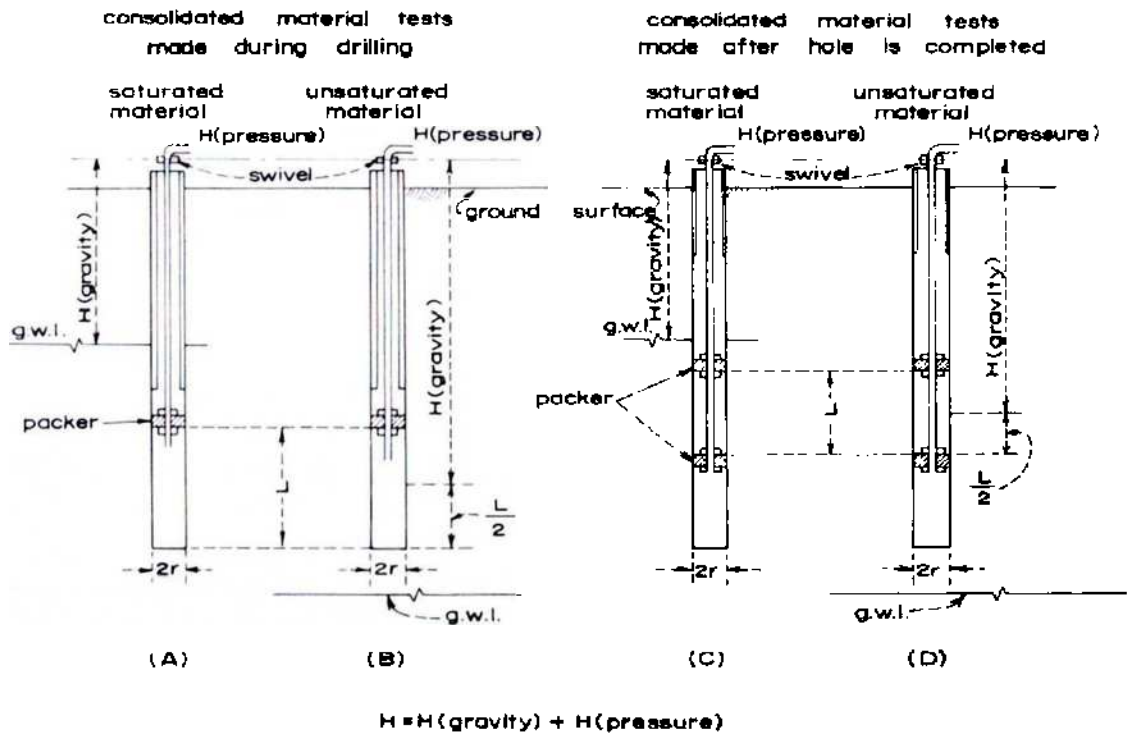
The packer test for soil permeability (after U.S. Bureau of Reclamation, 1960 and 1963).
